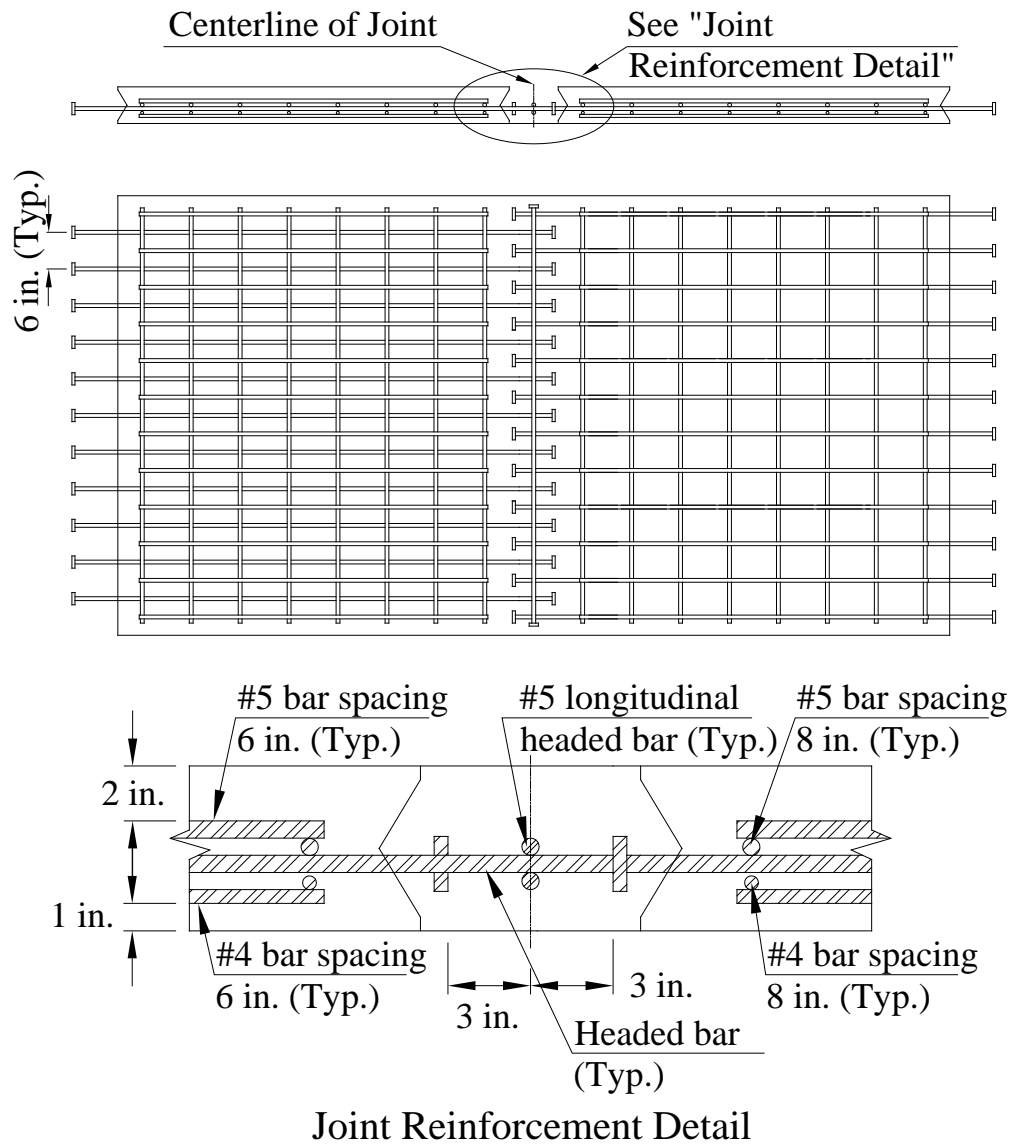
Reinforcement for Full-Sale Panel Test Specimens
